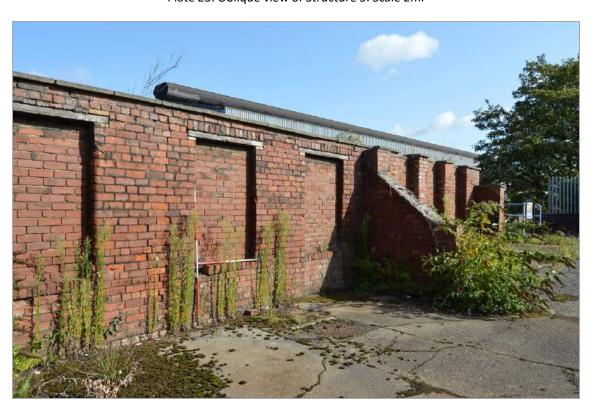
Blocked widows and east return of Structure 5. Scale 2m.
